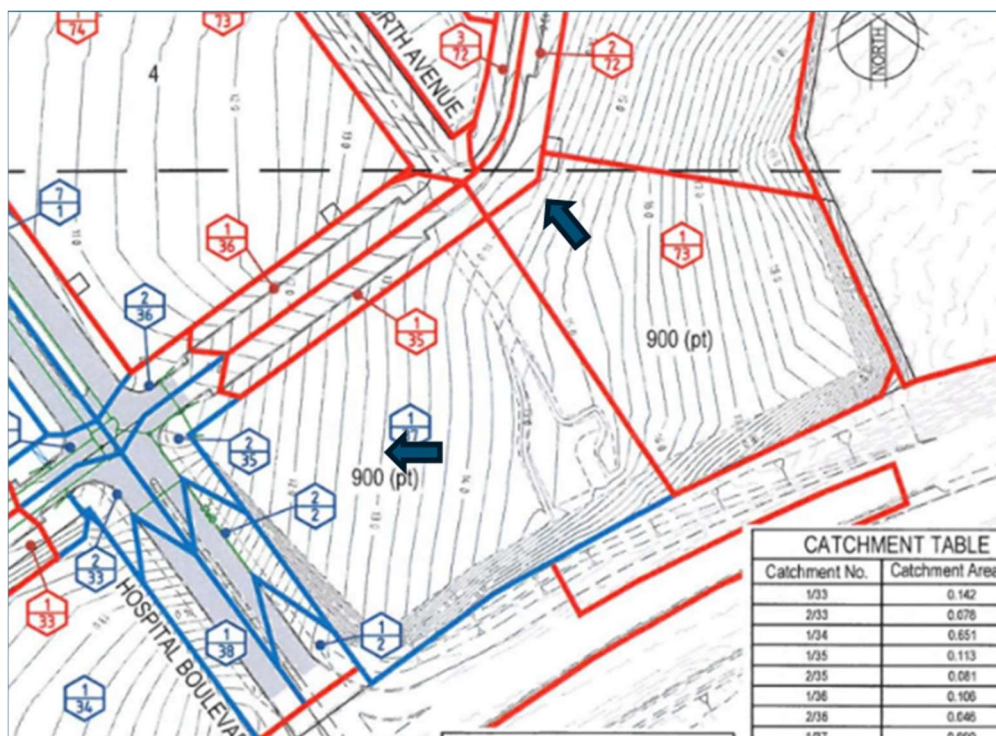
Masterplan Stormwater Management Catchment – Site layout
